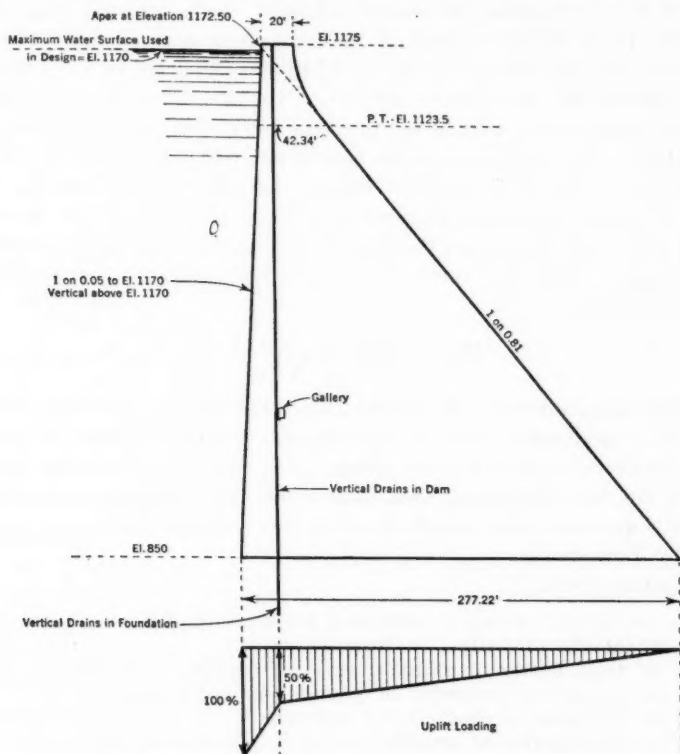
ADOPTED SECTION, PINE CANYON DAM.
